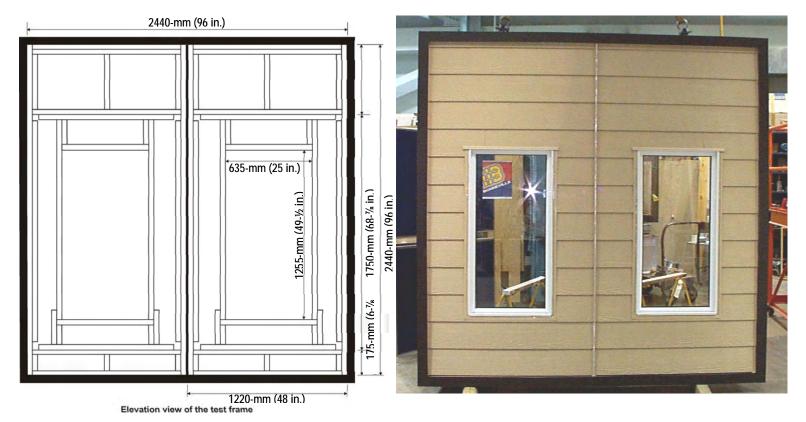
Typical layout of the wall Specimen for comparative investigation of the water management response of two side-by-side wall/window interface details (left). Elevation view of the exterior cladding of the Specimen completed (right).
